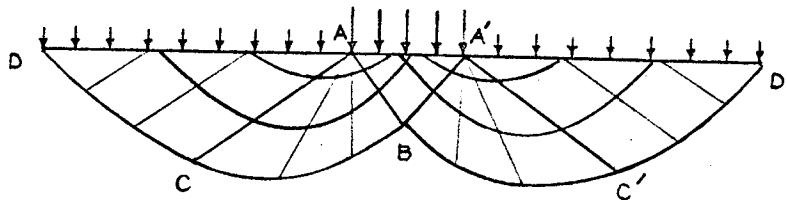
TYPICAL RUPTURE SURFACES BENEATH A FOUNDATION AT FAILURE
